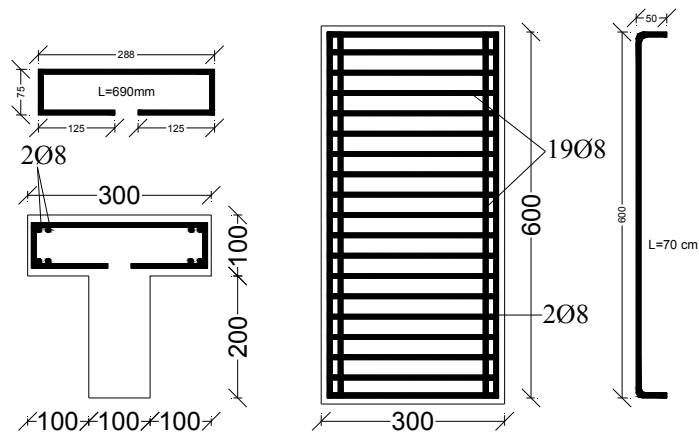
Reinforcement layout and geometry of specimen 4 (Specimen code 3.4 - loading at 1/4 of the length).
